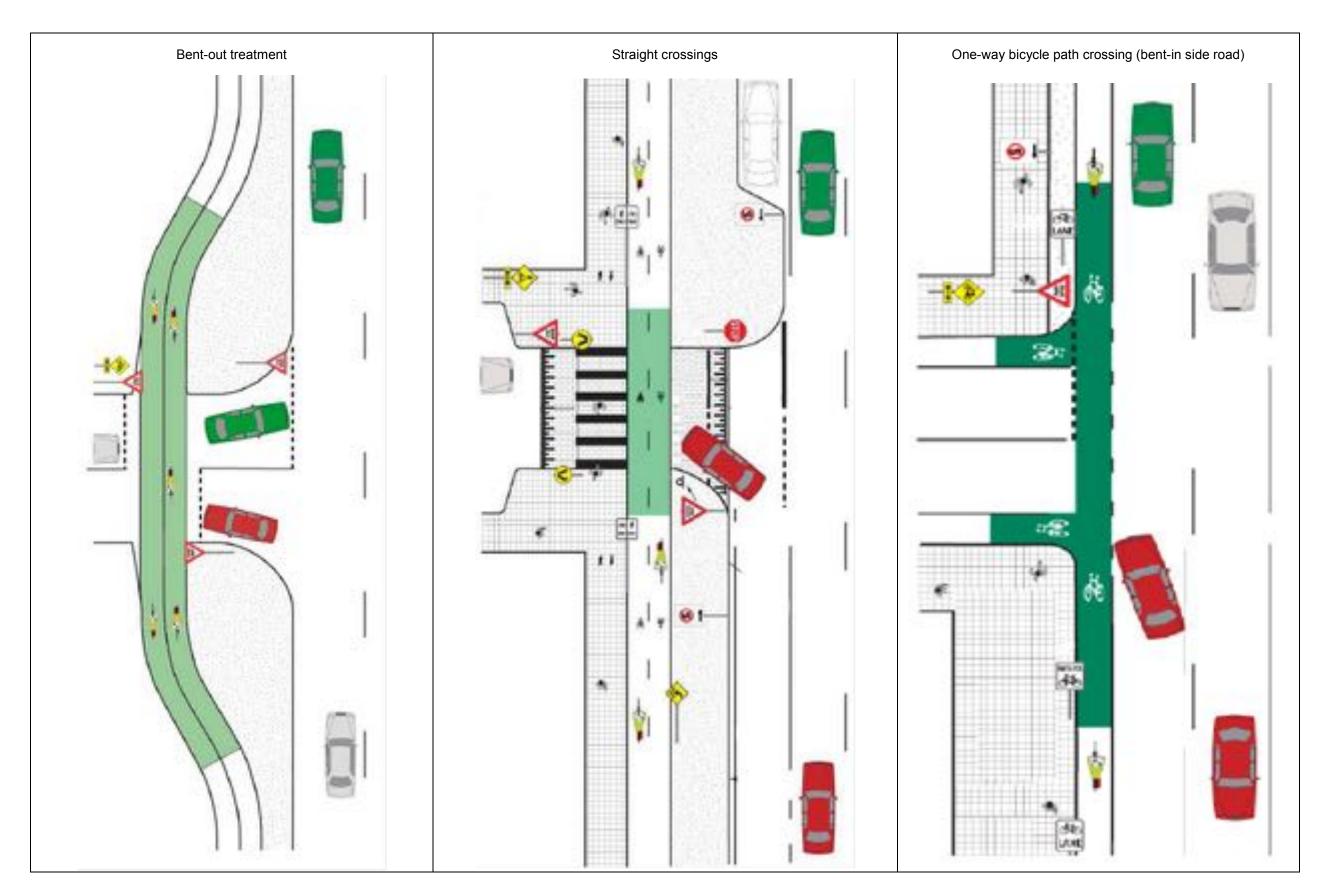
Types of crossings of side roads (Adapted from Section 7.6.6 of Cycling Aspects of Austroads Guides (2014))
